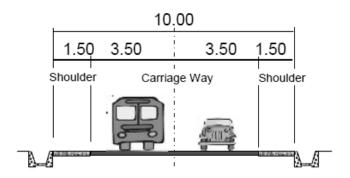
Typical Cross Section of Tj. Bunga - Takalar
